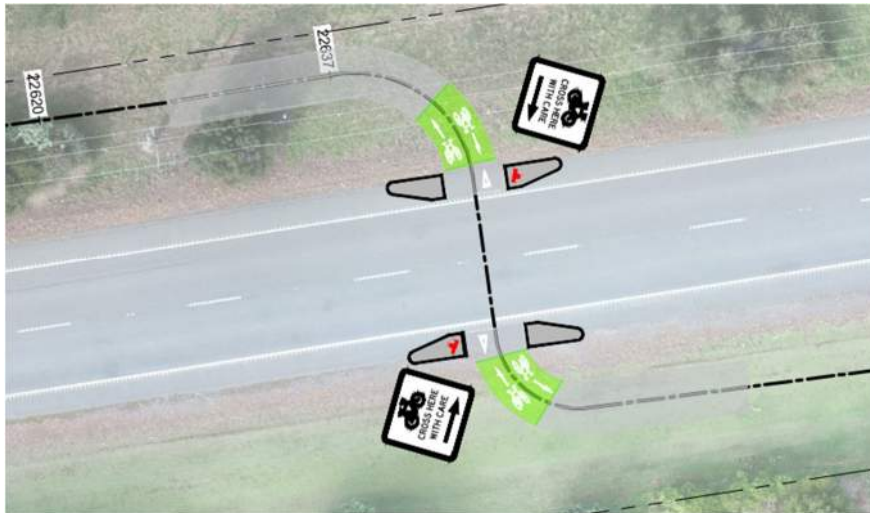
Proposed plan of the crossing point on Port Marsden Highway (SH15)
